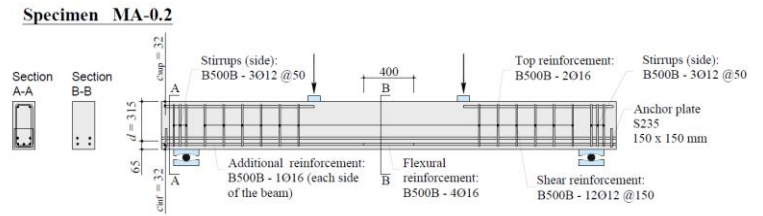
Reinforcement scheme of specimen MA-0.2-N
